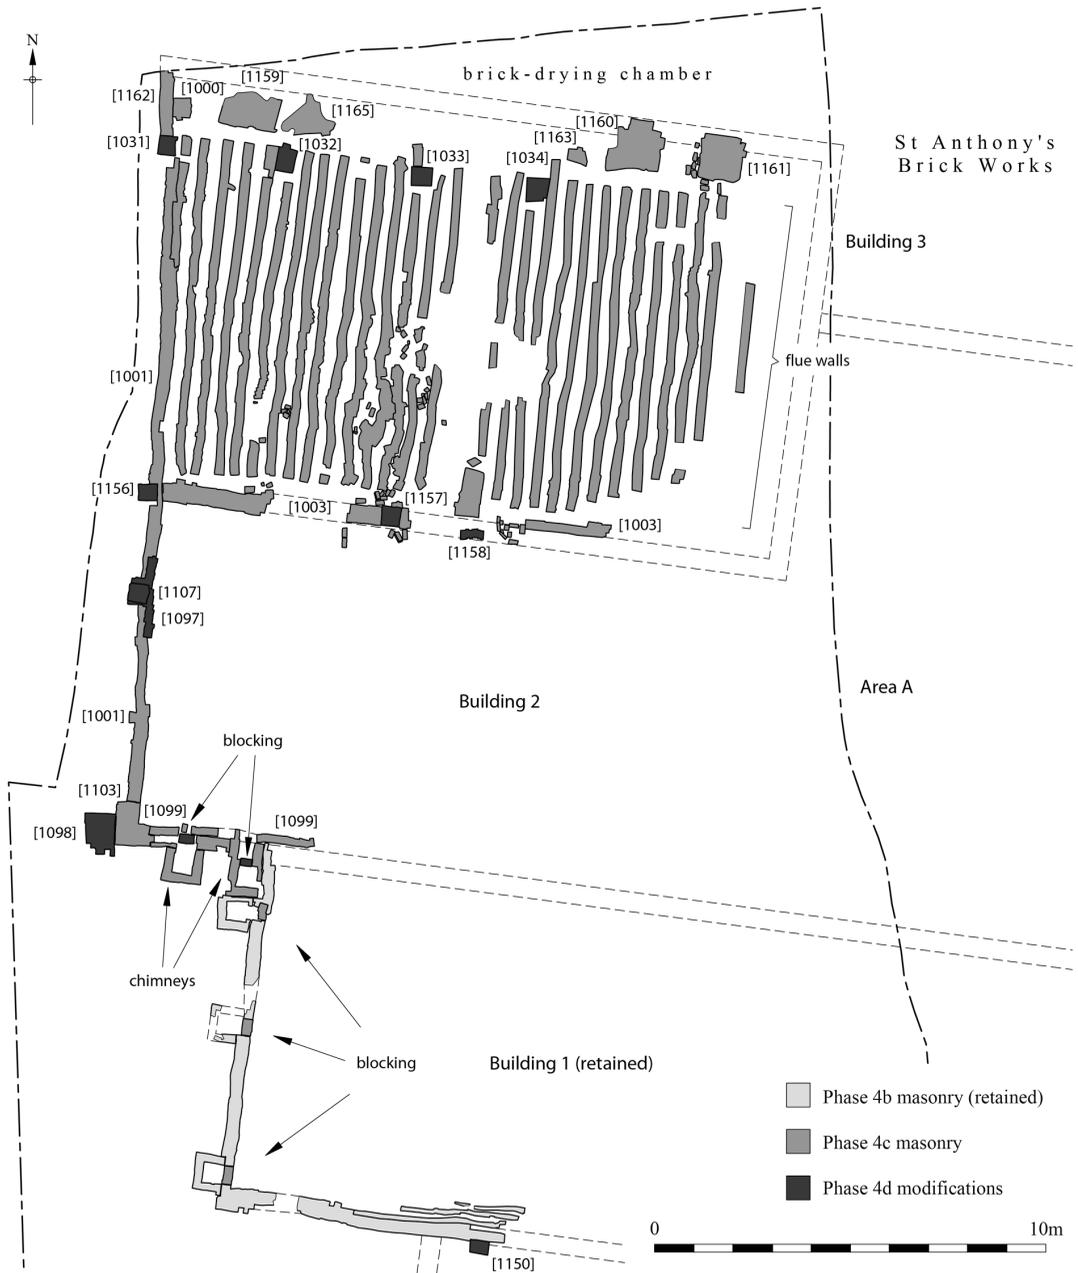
The Lightfoot Centre: plan of Phases 4c and 4d brickworks (Buildings 1-3).
